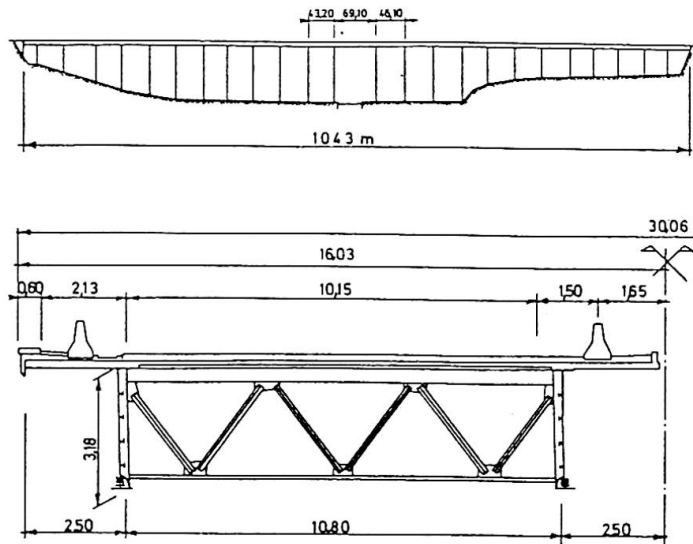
NEW "DEVALLEE" BRIDGE OVER THE RIVER SCHELDT AT TOURNAI
